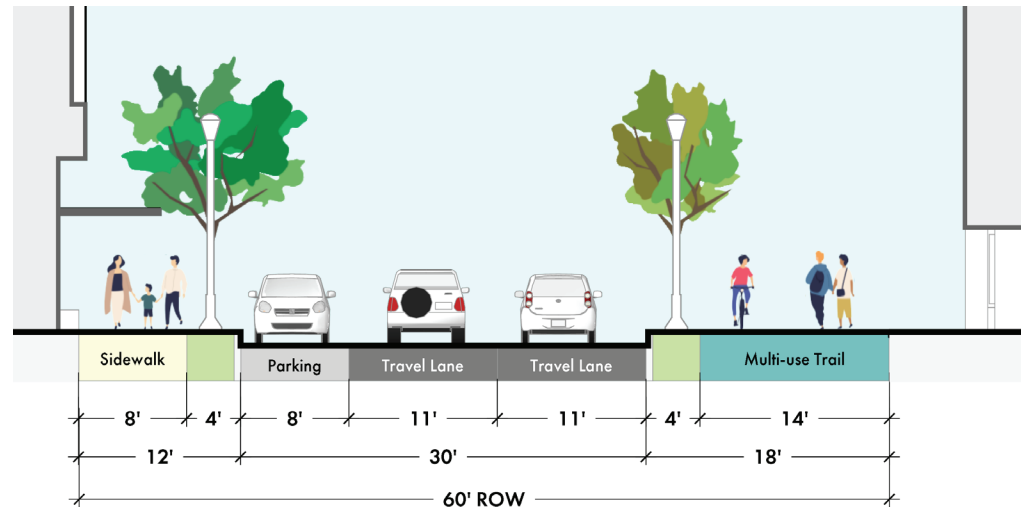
Proposed Typical Street Section w/ Multi-Use Trail
